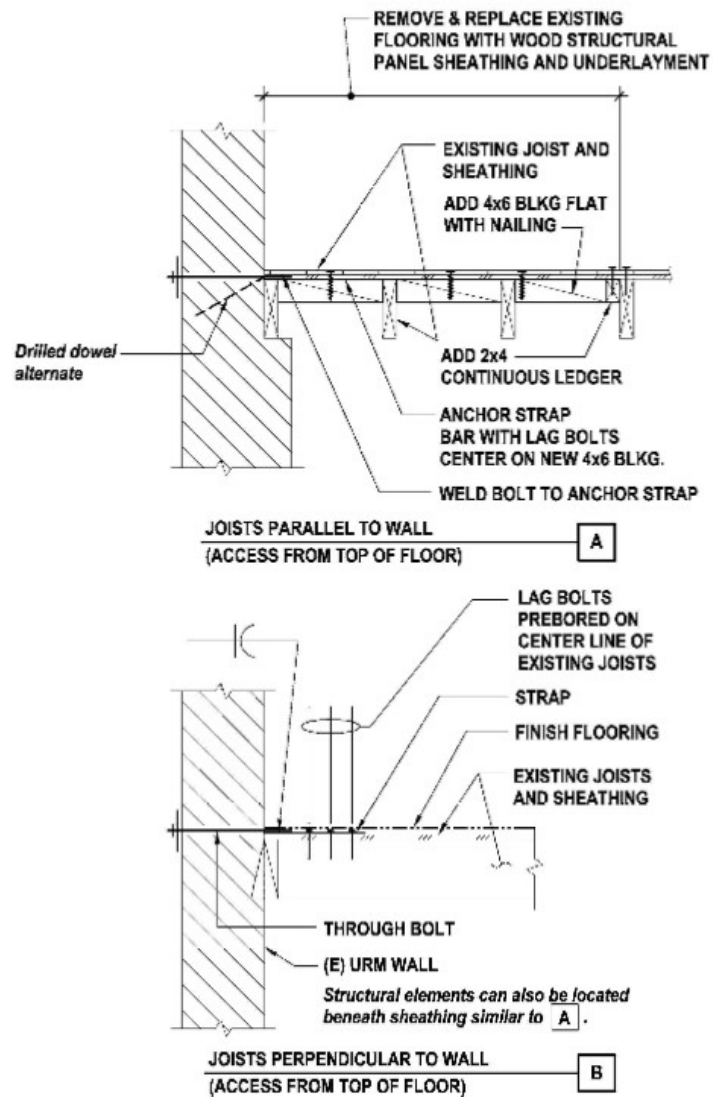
Tension Anchors Installed from Above the Floor
